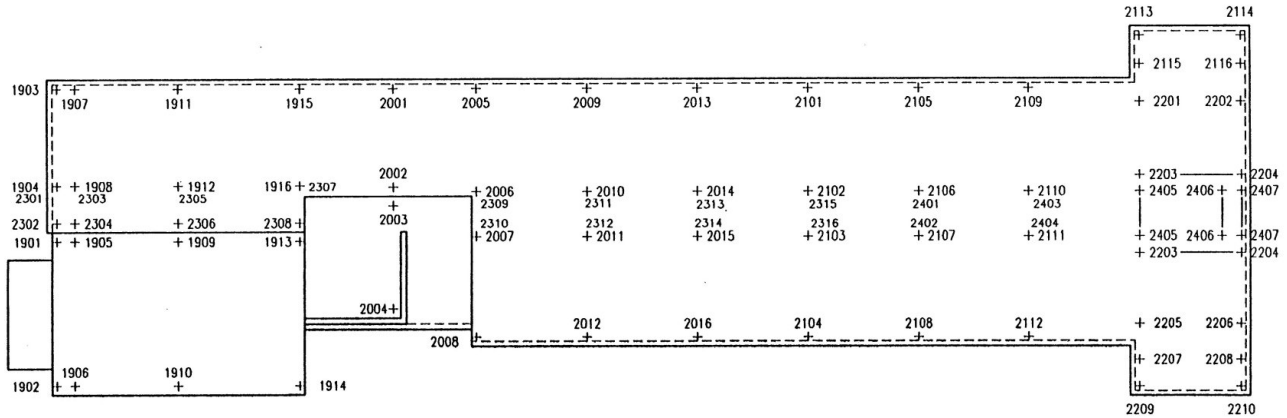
Plan View of School Showing Location of Truss Uplift Loads (North is towards top of page)
